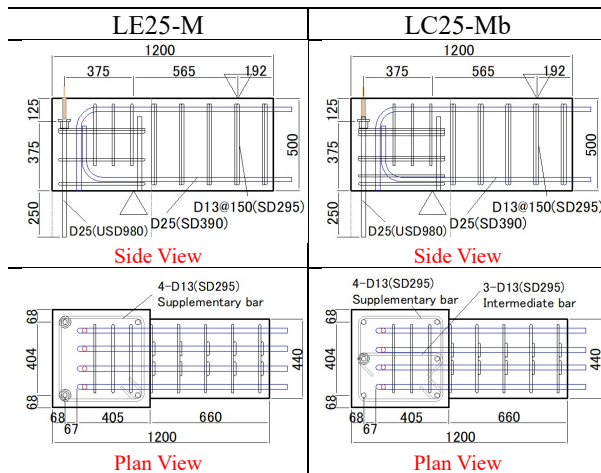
Cross-section and detail of the LE25-M and LC25-Mb Specimens (unit: mm)
